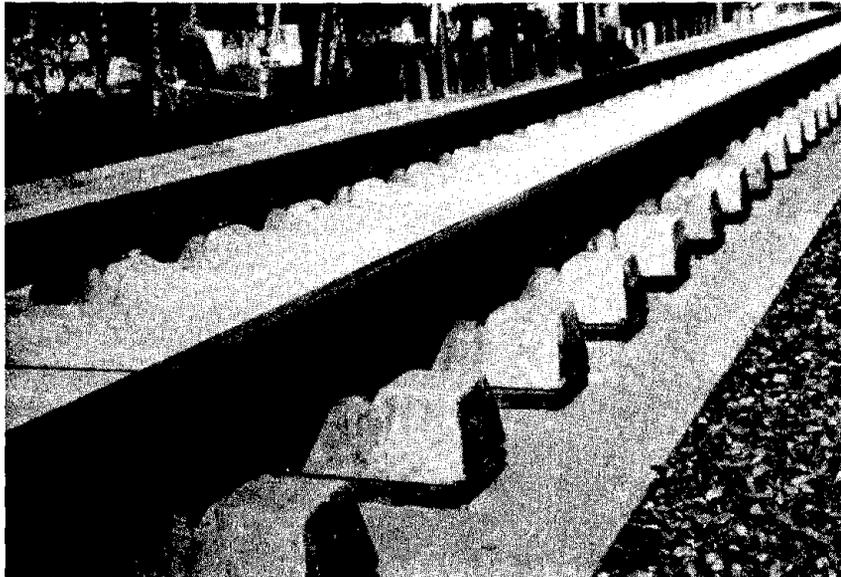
RUBBER-BOOTED CONCRETE TIES SET INTO
